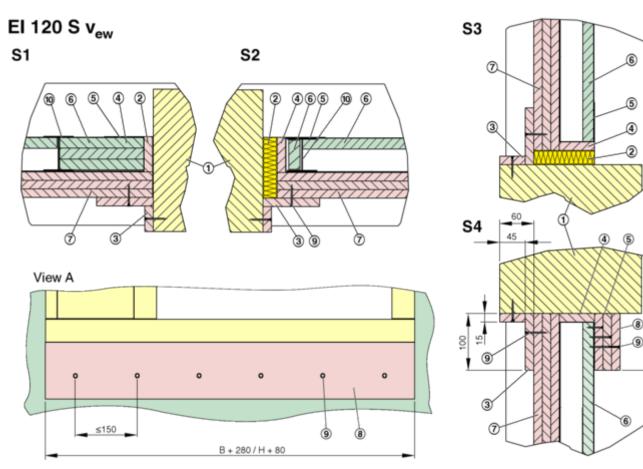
Details EK-JZ Dry installation in Gypsum Wall with metal stud El 120 S
